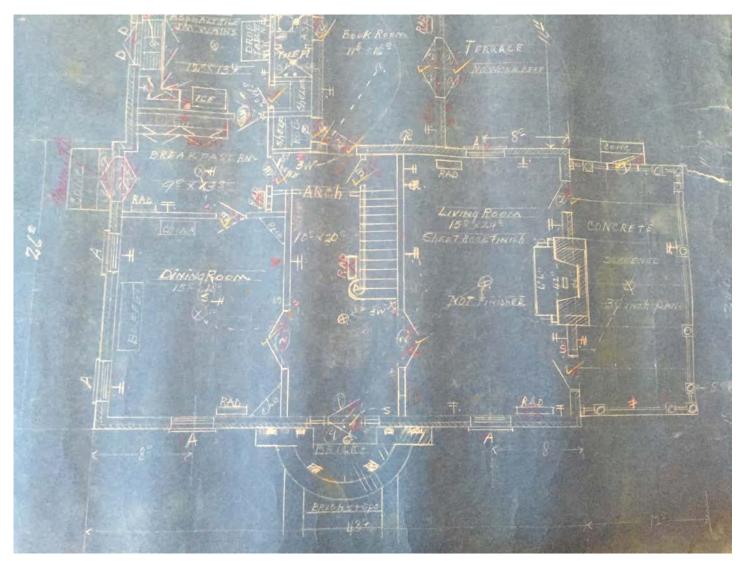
Original portion of first floor plan; image courtesy of the author.
